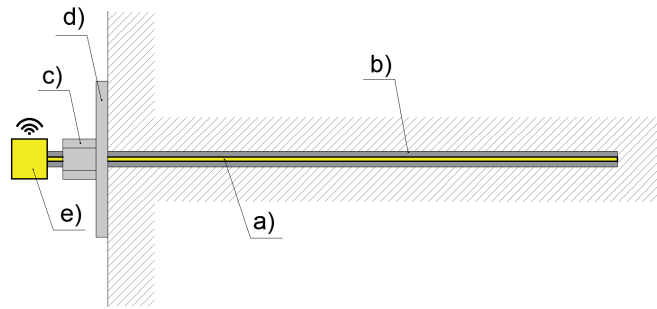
Intelligent rock bolt components: (a) deformation sensor; (b) rock bolt (steel bar), (c) nut; (d) plate (e) wireless readout unit (collecting and sending data) (after Varelija and Hartlieb, 2024).
